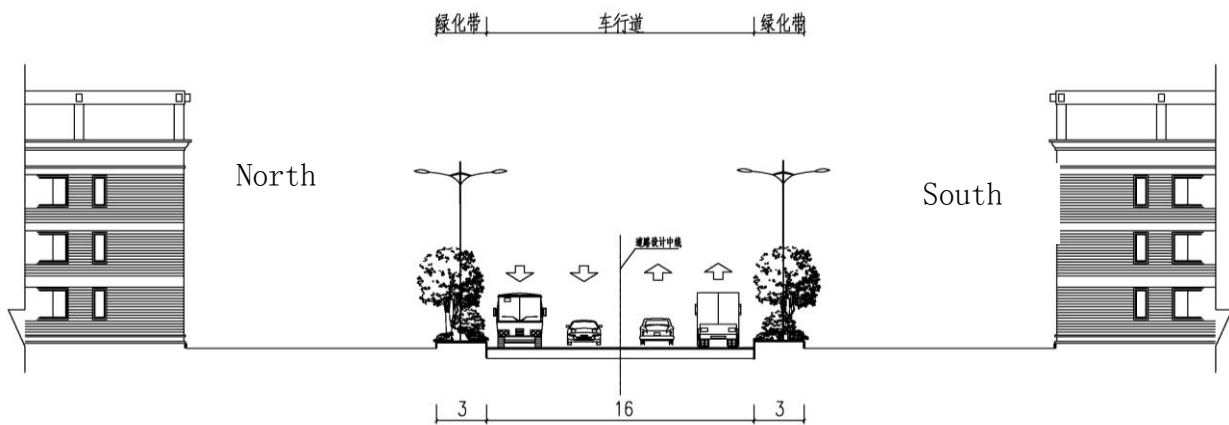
Sectional View of Existing Biyun Road (Jinqiu Avenue ~ Everest Food Company)
